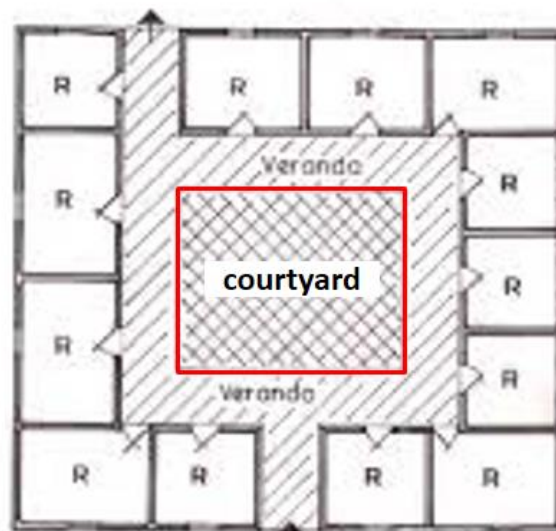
Schematic Layout of a Traditional Compound House Showing Central Courtyard (Typical Vernacular Design in Hot Climates, Applicable to Hausa Architecture)
